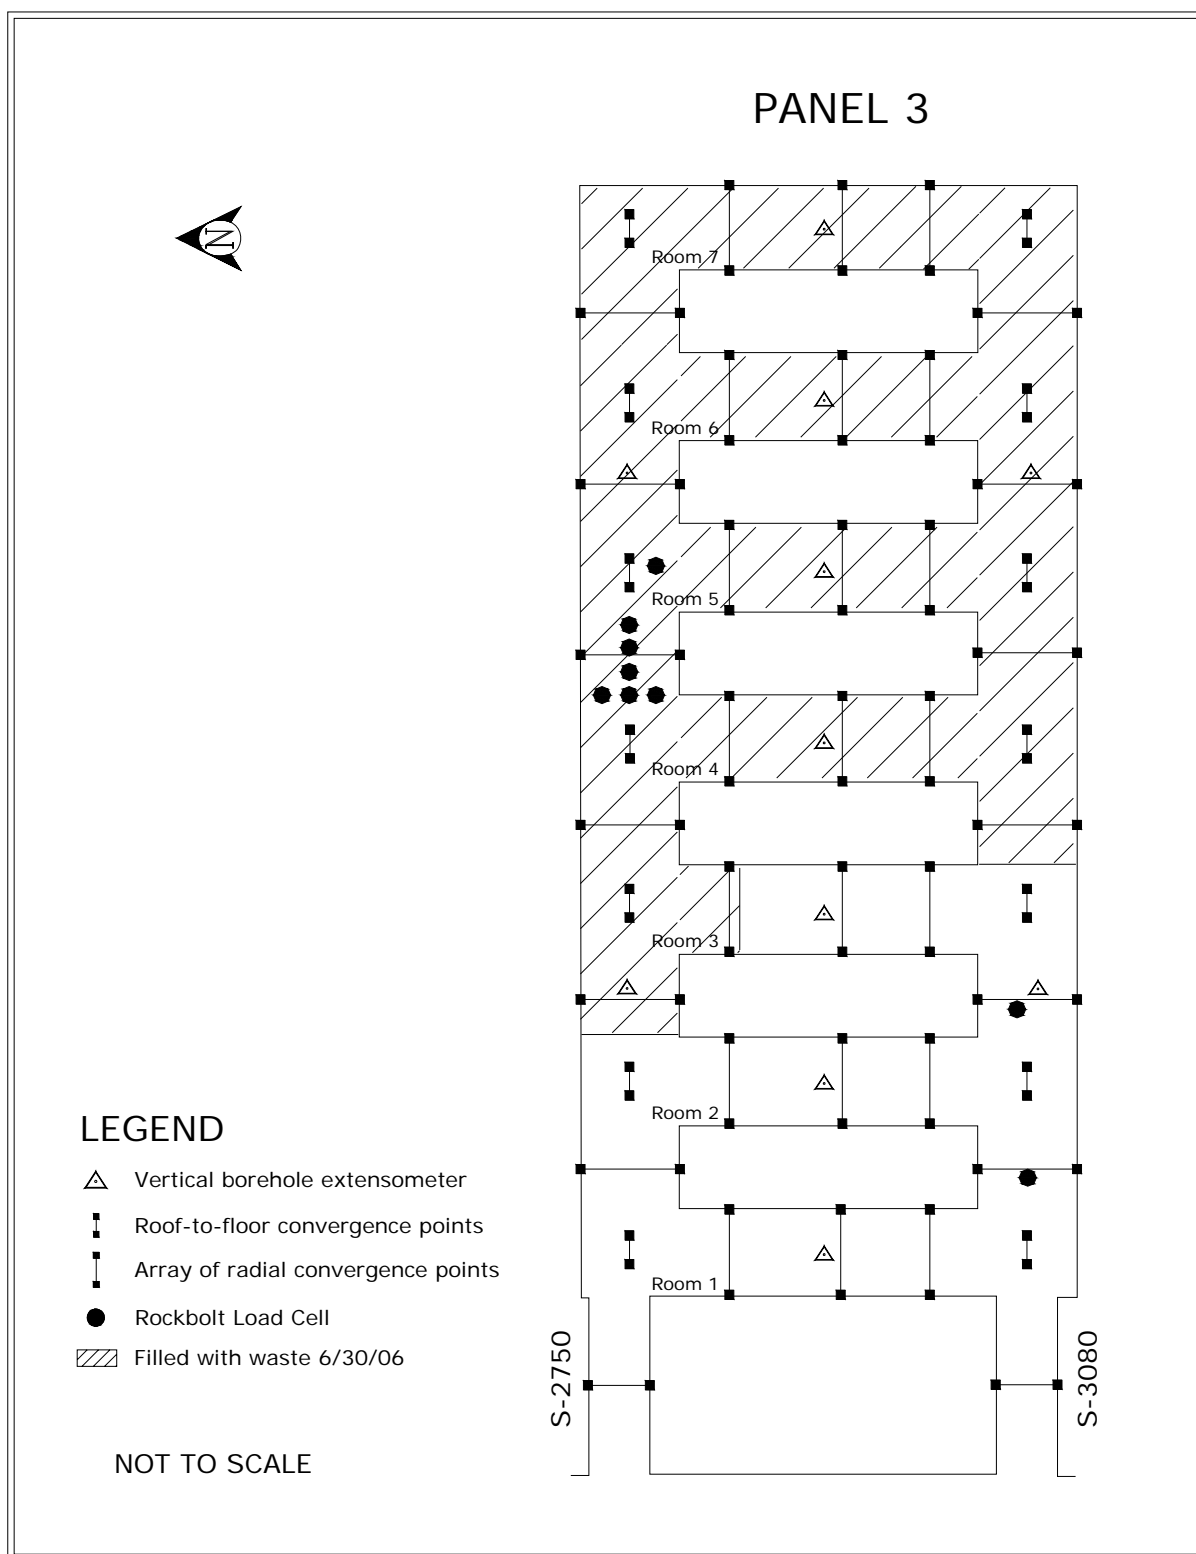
Location of Panel 3 Geotechnical Instruments
